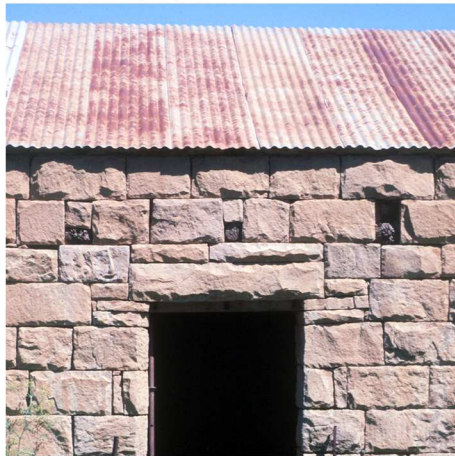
Stable door, with similar lintel and adjustment detail than is found on the older part of house. (1987)
